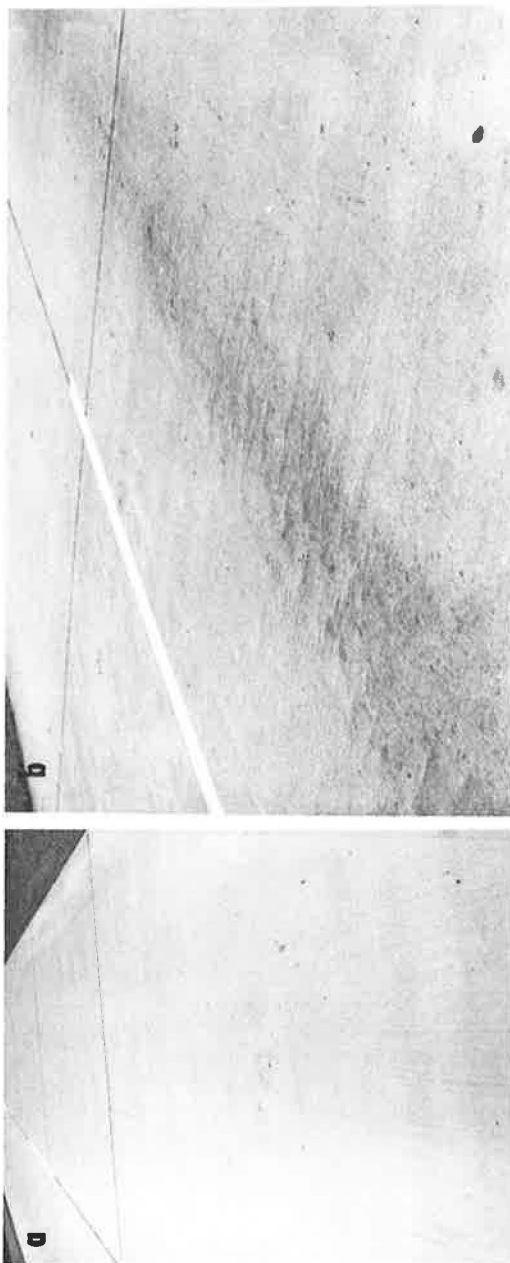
Concrete pavement: (a) with fly ash, and (b) without fly ash.
